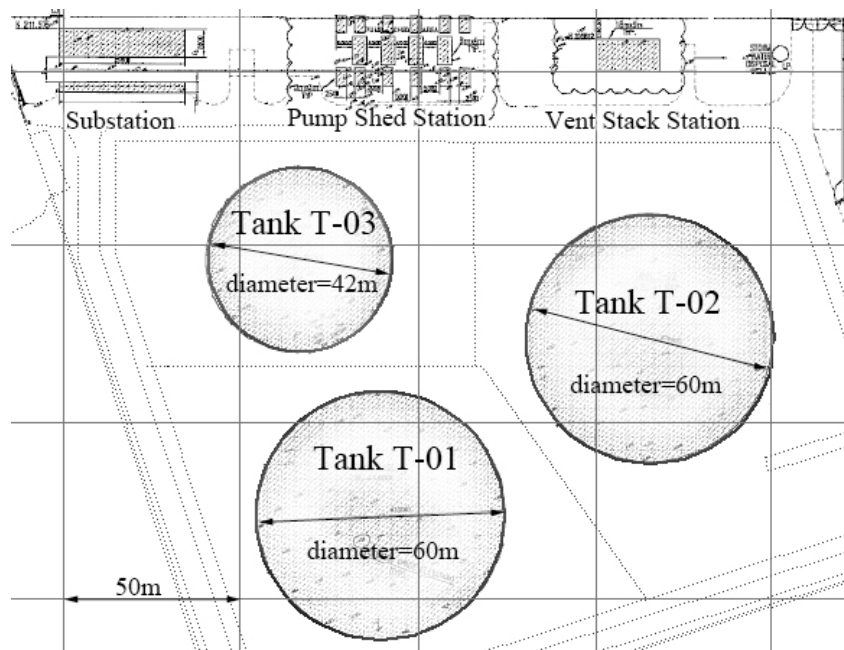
HFO Bunkering Facility site in Ras Laffan
